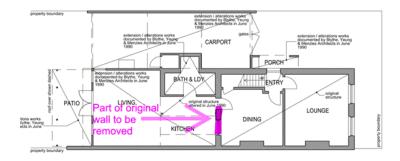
Floor Plan showing the portion of the original wall proposed to be removed
